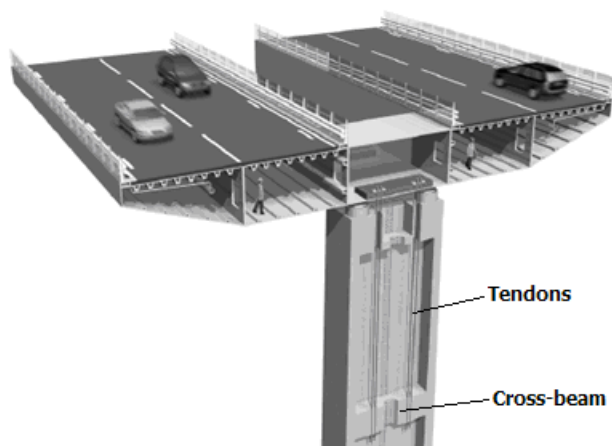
Cross-section of the supports showing the prestressed tendons and the cross-beam where the tendons were anchored. Vägverket (2007)
